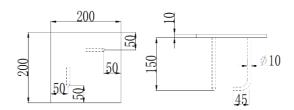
Equipment foundation drawing (unit: mm)
